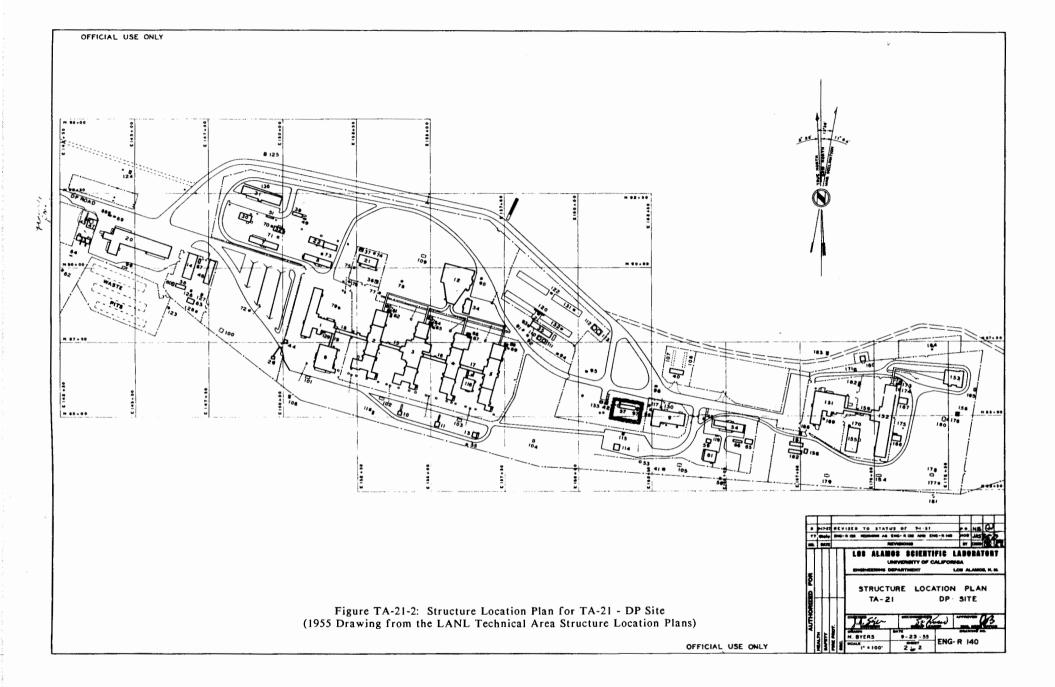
Structure Location Plan for TA-21 - DP Site
